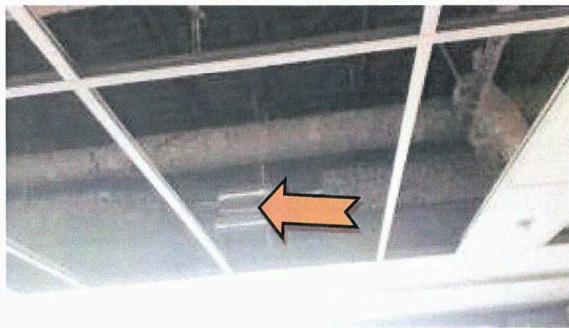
Level 20 - Ceiling space – Pipe work to heaters around perimeter – Foam insulation with non-asbestos-containing bitumen layer. Sample 22505-001-025.
